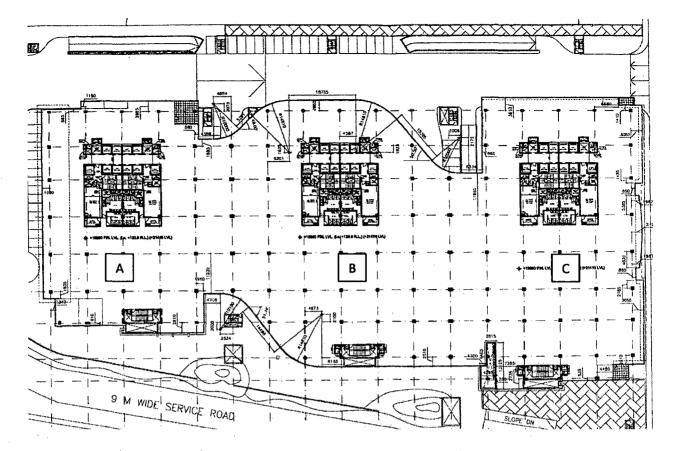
DLF Infinity tower, Floor plan Source: DLF Architectural Section
